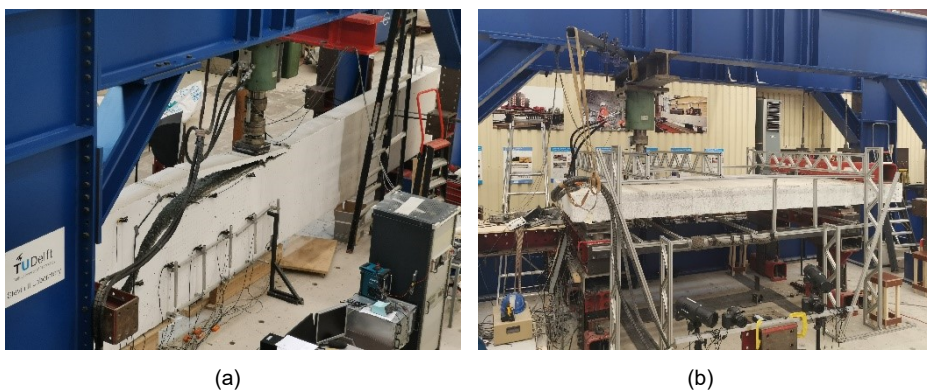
Photos of the tests on (a) reinforced concrete beams and (b) reinforced concrete slabs.
